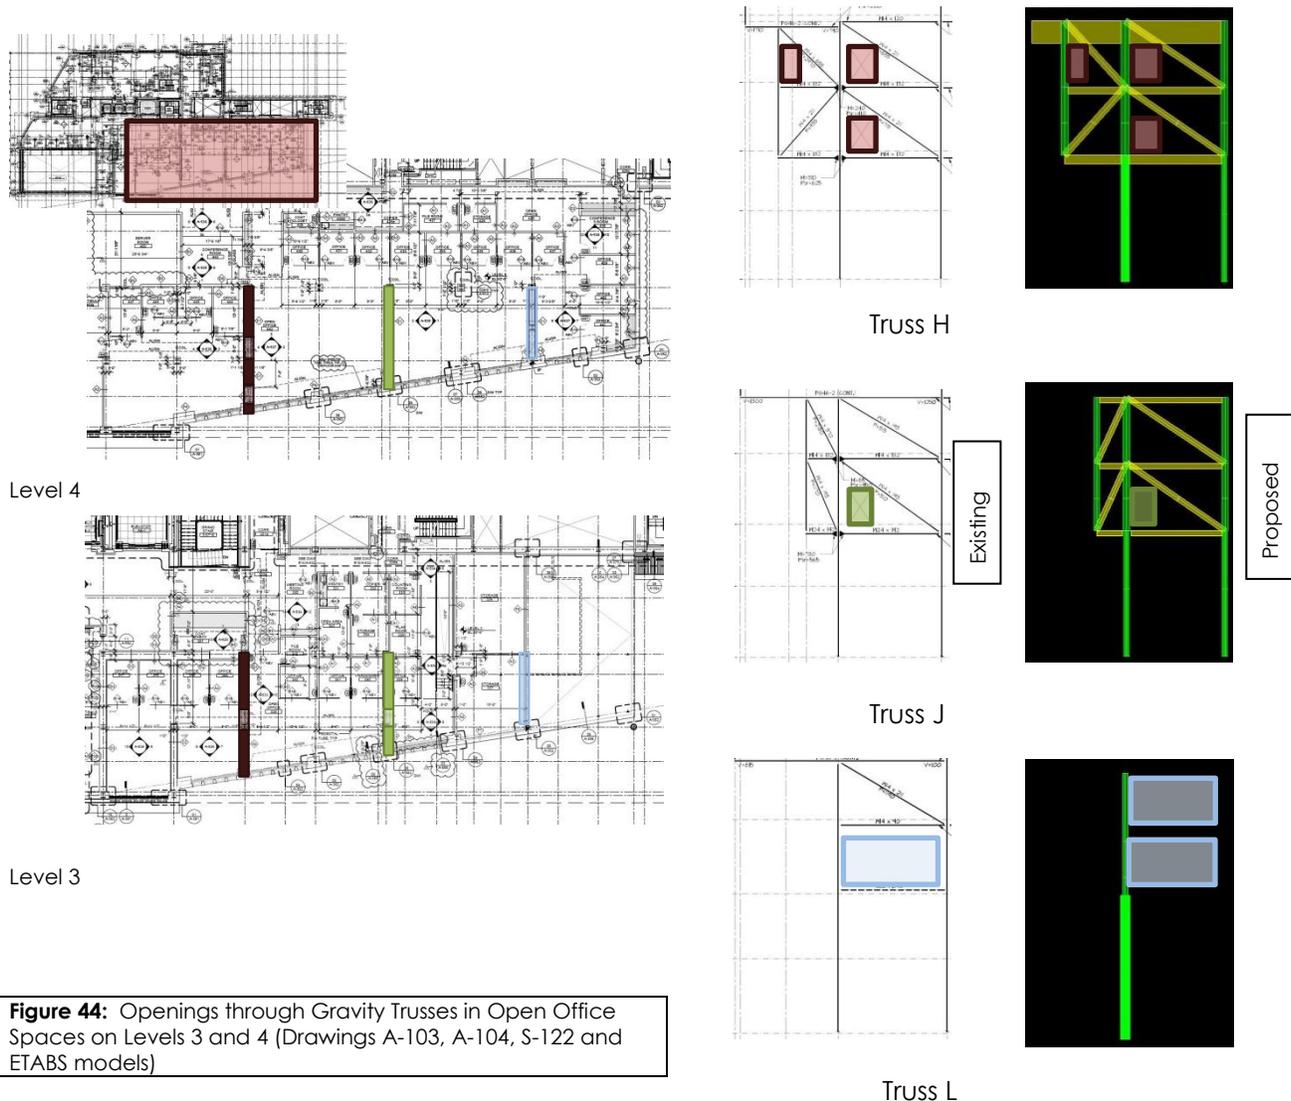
Openings through Gravity Trusses in Open Office Spaces on Levels 3 and 4 (Drawings A-103, A-104, S-122 and ETABS models)
